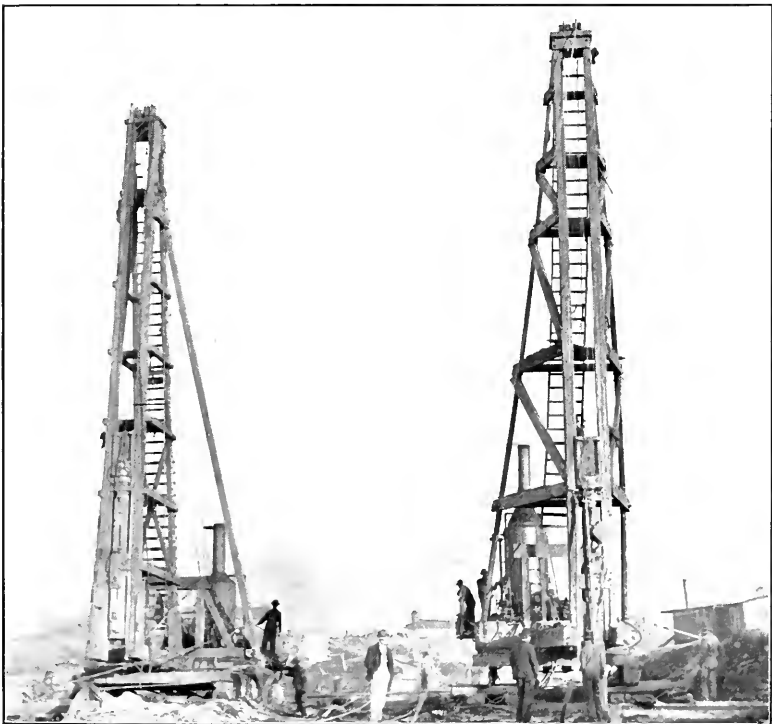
PILE-DRIVERS, SHOWING SPECIAL ARRANGEMENT OF FOLLOWERS.
